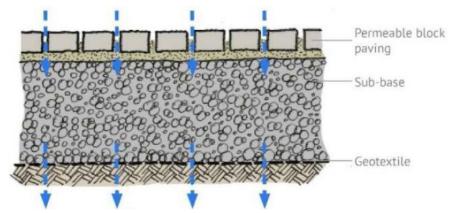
Typical section through permeable paving and sub-base showing infiltration
